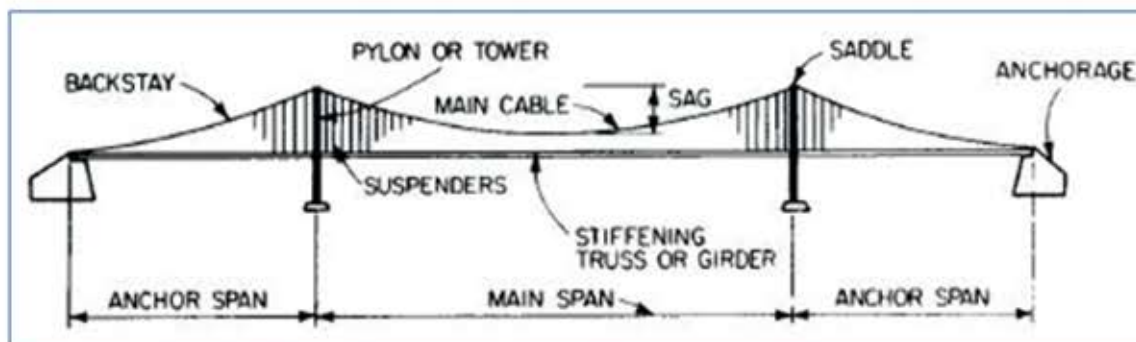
Three-span Simple Suspension Bridge (<http://www.civilengineeringx.com>)
